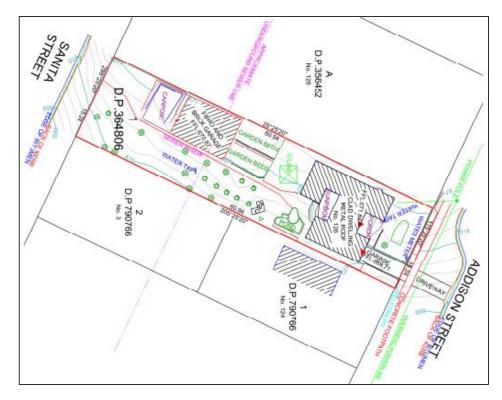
Existing survey plan - 126 Addison Street Goulburn
